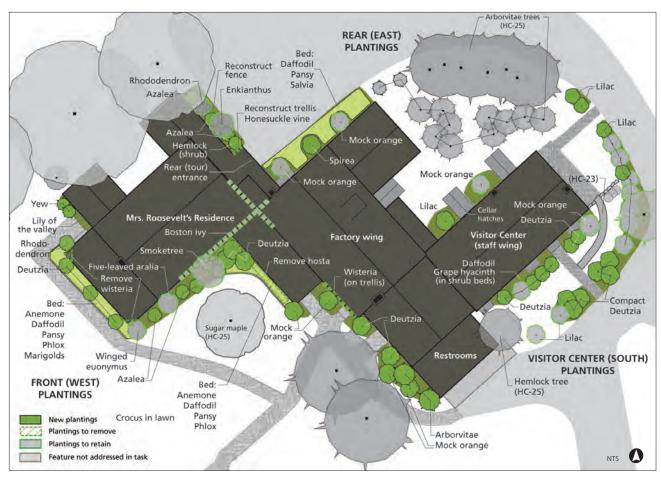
Conceptual planting plan for Val-Kill Cottage. (SUNY ESF)
